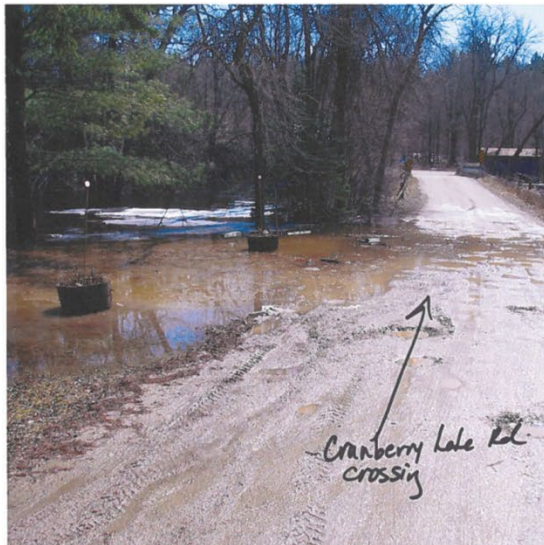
PHOTO #3 TAKEN AT CRANBERRY LAKE ROAD CROSSING ON APRIL 15, 2014
